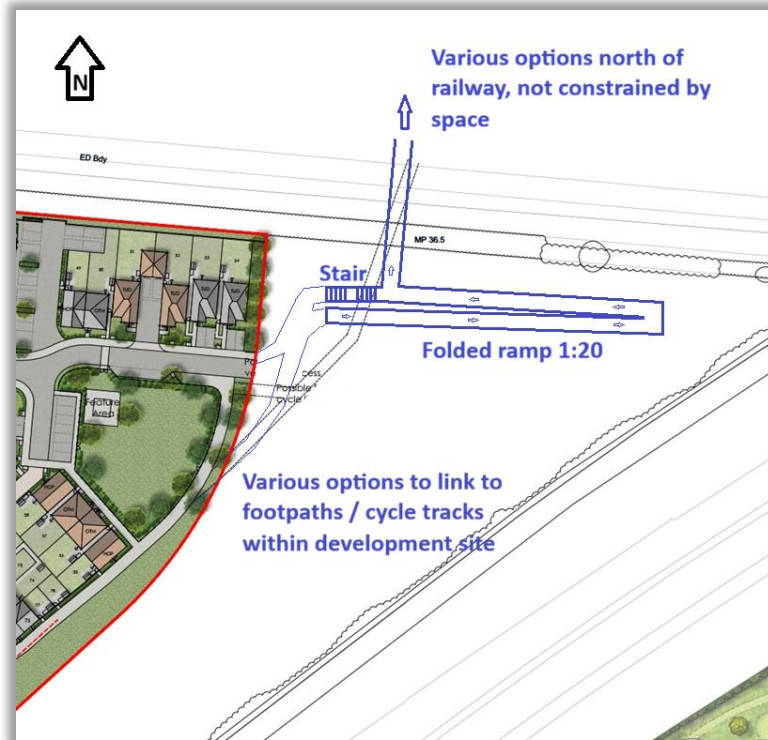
C – indicative layout of folded steel ramp south of railway, demonstrating flexibility of land take for structure within the safeguarded land and multiple points of connection to proposed path network
